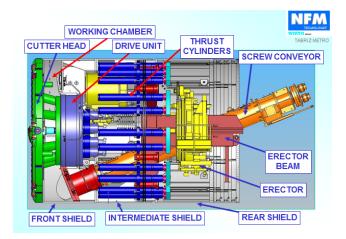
Schematic view of the main parts of Tabriz metro tunnel boring machine21.
